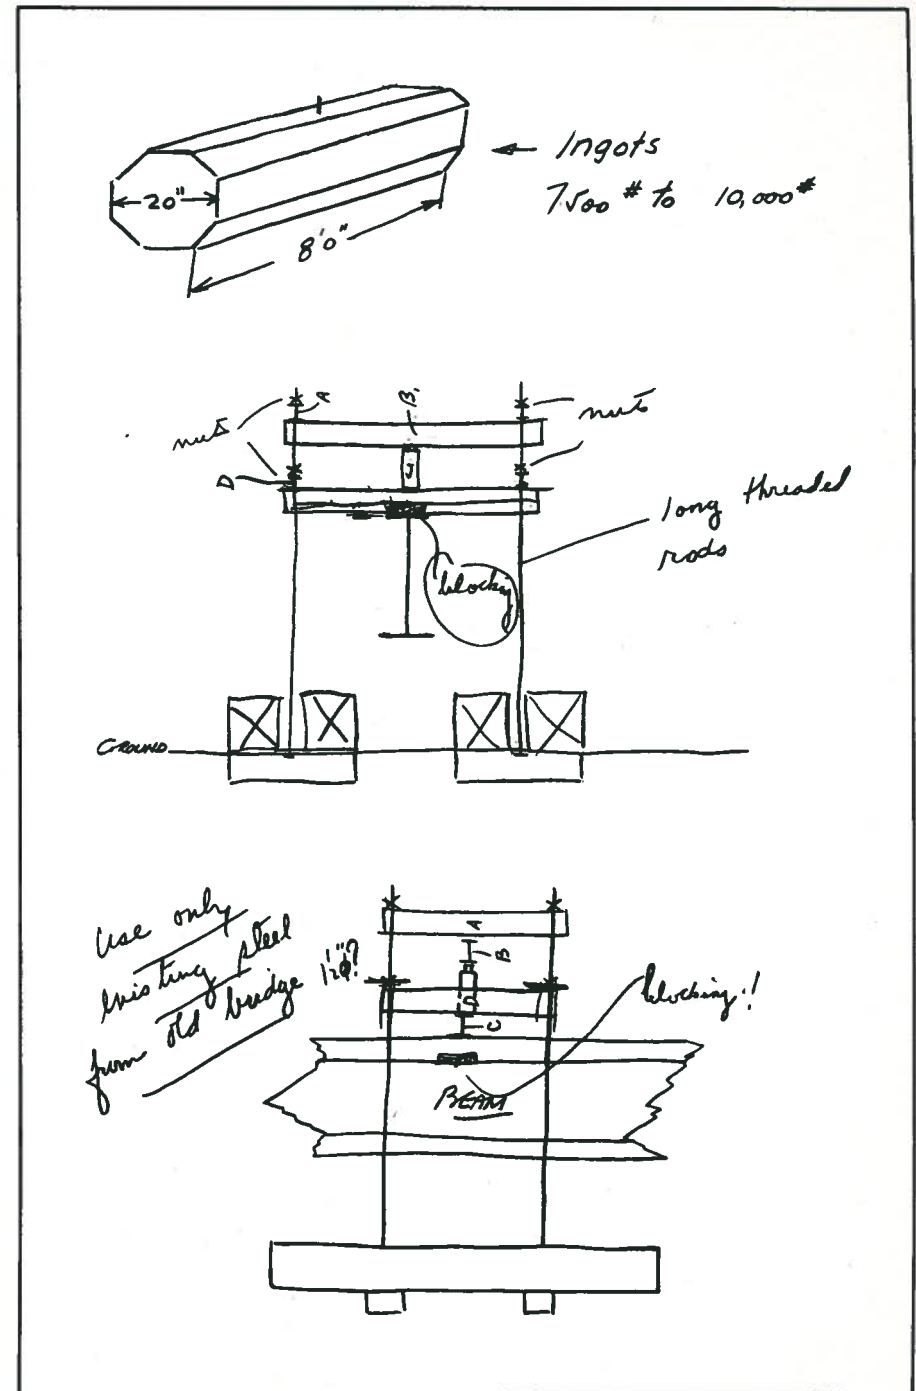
Portions of Magnel's original rough sketches of the proposed testing arrangement for a 160-ft (49 m) girder used in the main span of the Walnut Lane Bridge. For contrast refer to the actual drawings (see Fig. 15).
